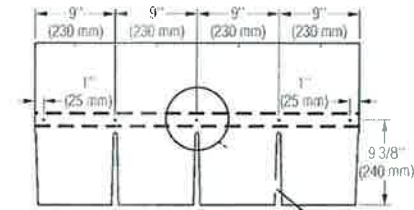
Fastening Hatteras Shingles on Low and Standard Slopes
